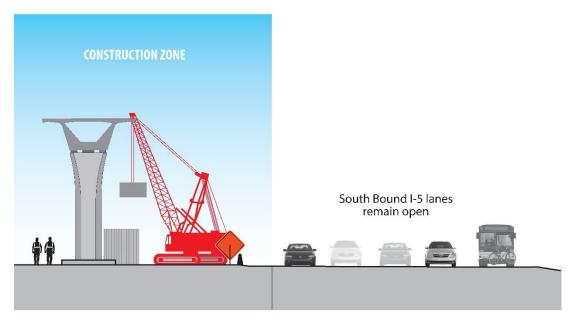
Construction along I-5 (Typical Cross-Section)
